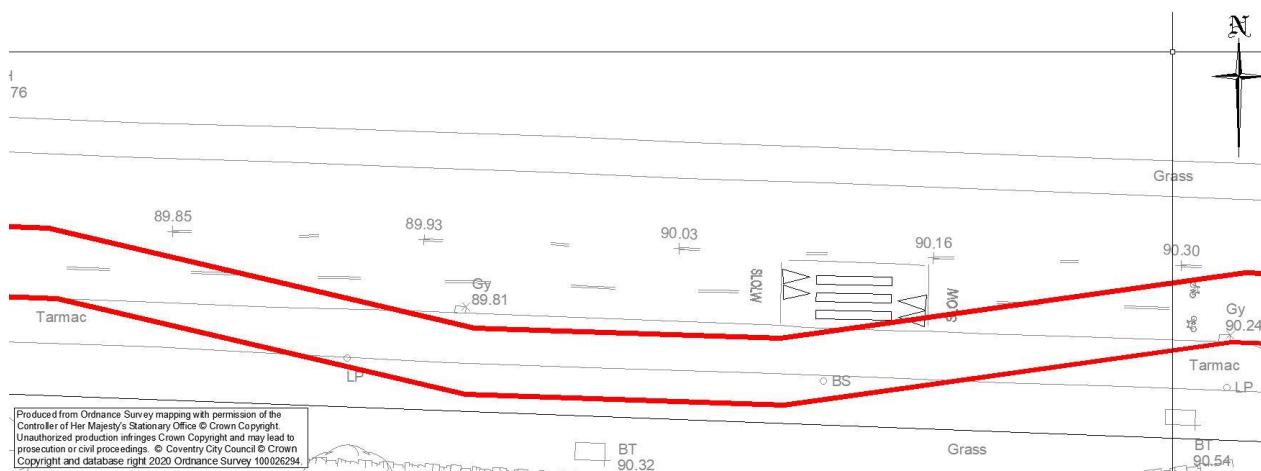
Location Plan – Charter Avenue Bus Stop (east of Sir Henry Parkes Road)
